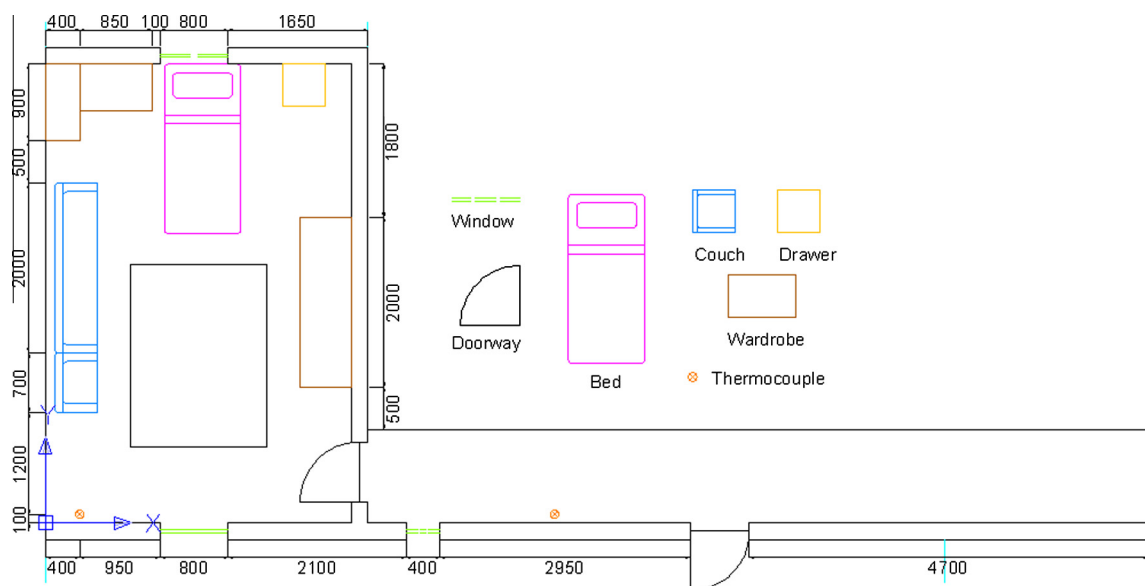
Parkes test room floor plan (dimension in millimeters).
